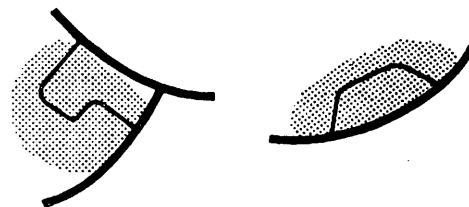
British road layouts favored over cul-de-sacs (Source: *Roads and Traffic in Urban Areas*, p. 261).
